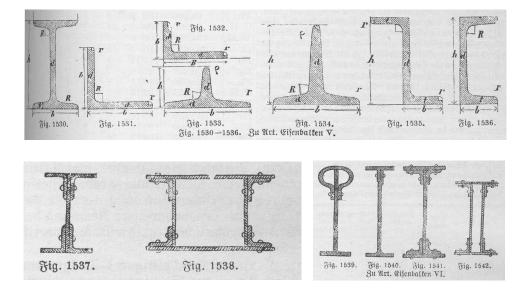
Solid beams rolled and plate beams fitted by riveting (Mothes 1882)
